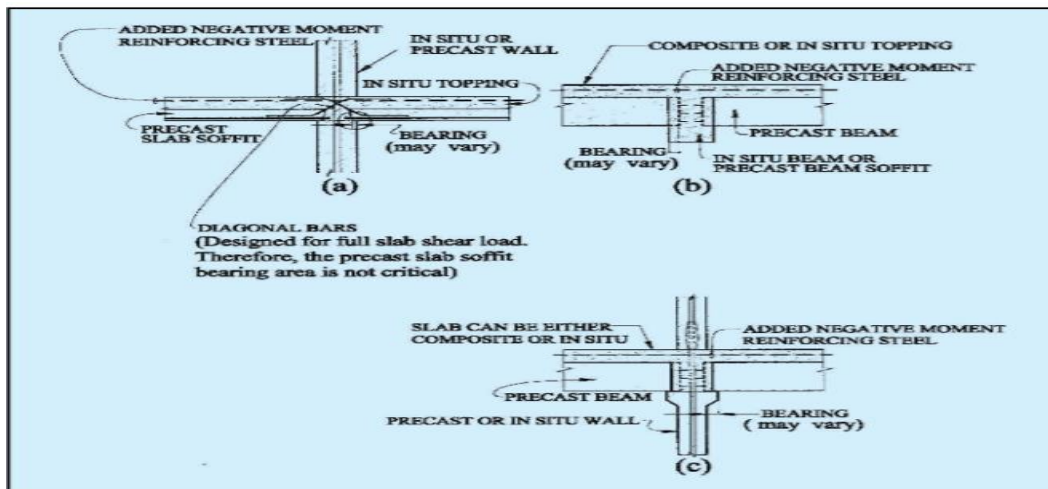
it shows the example of precast reinforced concrete connection. (Yee, 2001)
